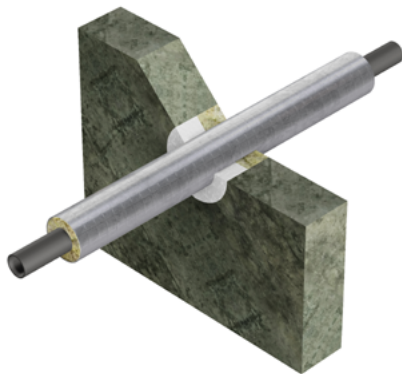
Thickness of GPG 50 mm. Interrupted pipe insulation 40 mm thickness, with 600 mm extending out on each side of the wall
